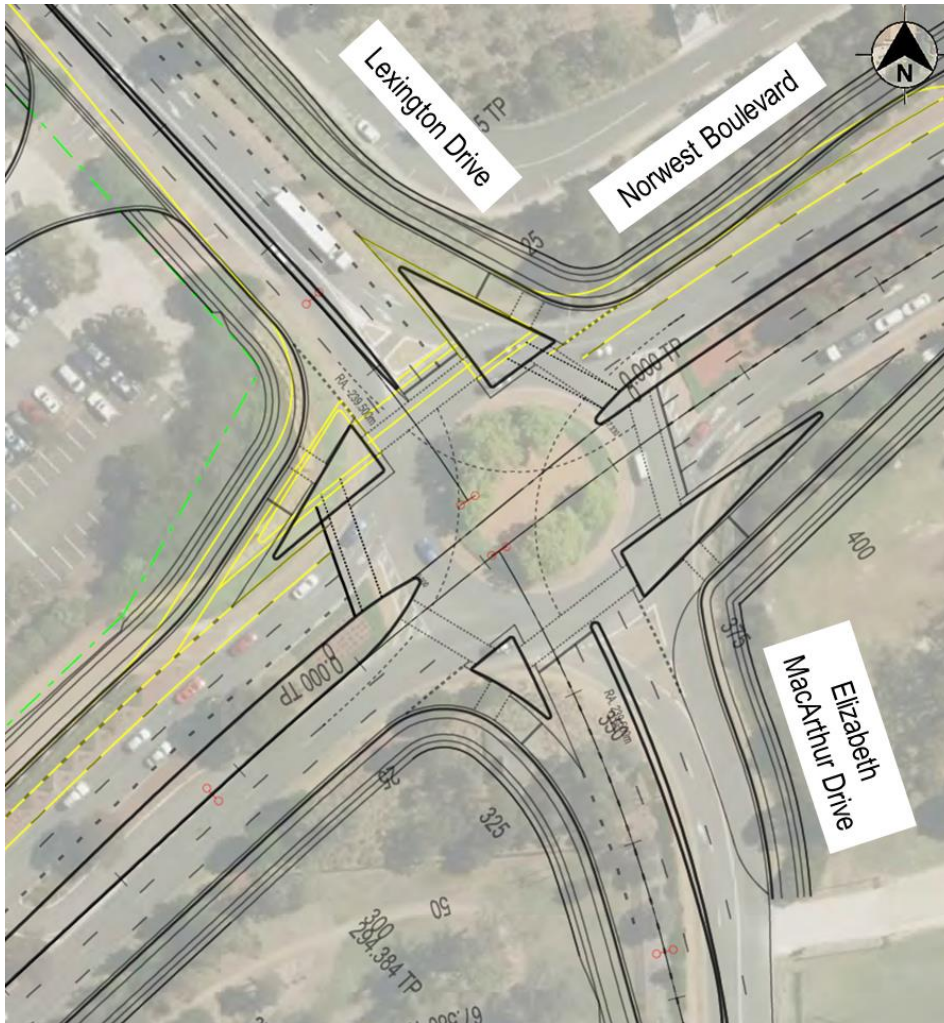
Ultimate Upgrade of Norwest Boulevard / Lexington Drive Intersection (Option 3)
